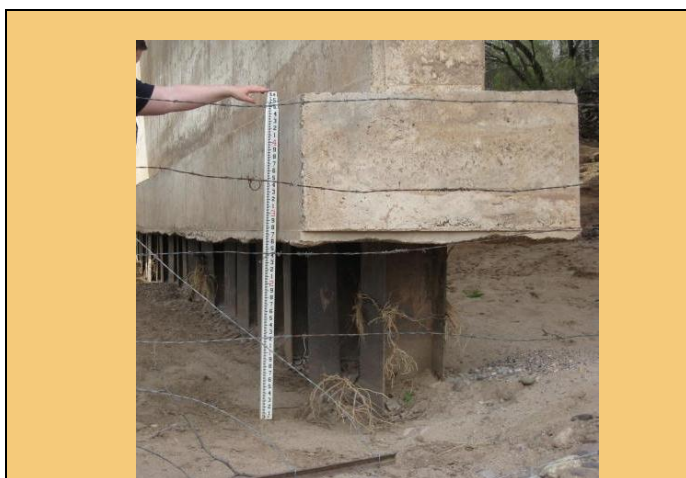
Downstream facing oblique at Pima Mine Rd.
